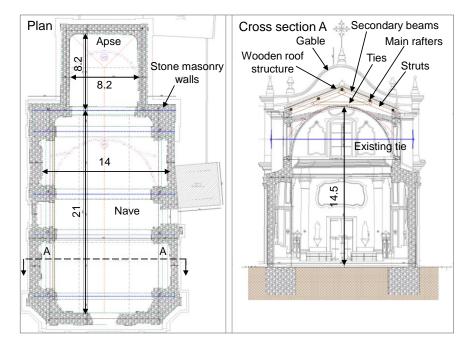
Plan and cross section of the case-study church; dimensions in m.
